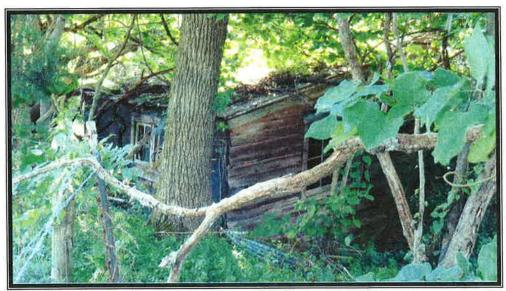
View of kitchen rear (west) elevation and addition, looking east.
